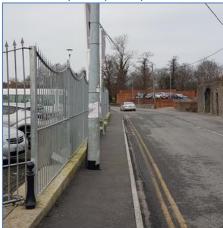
Restricted Footway Width on Blackcastle Road adjacent to scheme
